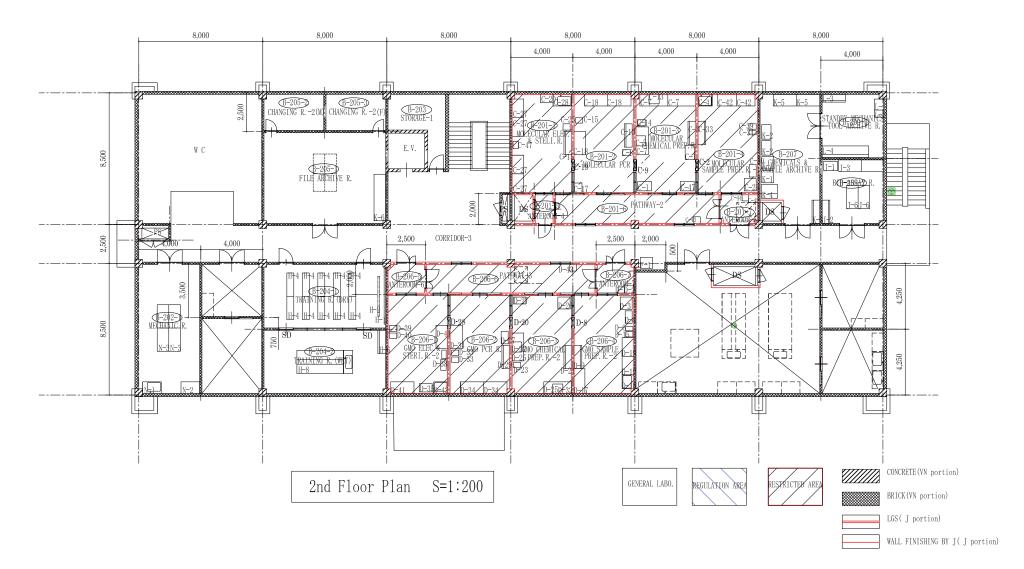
RETAQ center Reference Test Building: 2nd Floor plan
